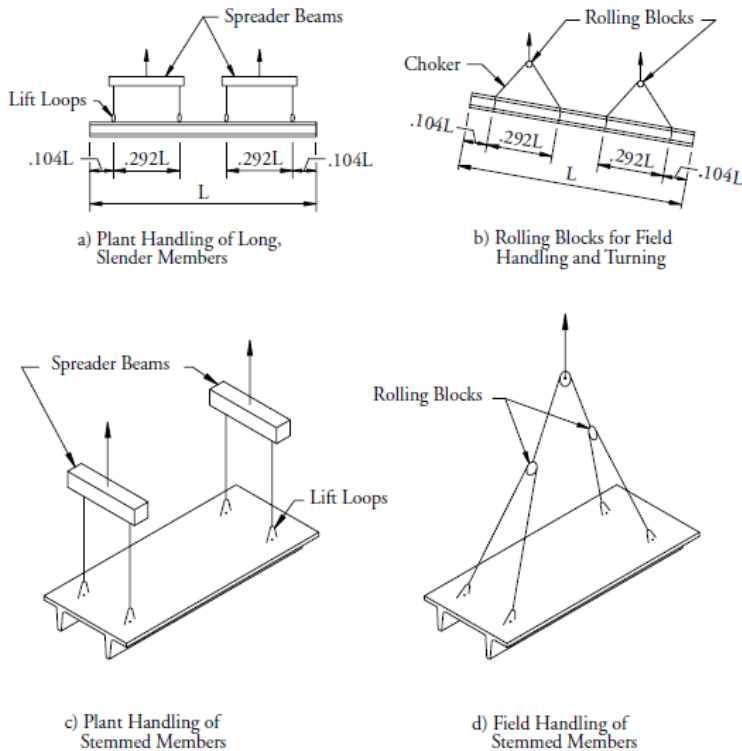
Rigging for multiple point lifting (PCI Bridge design manual)
